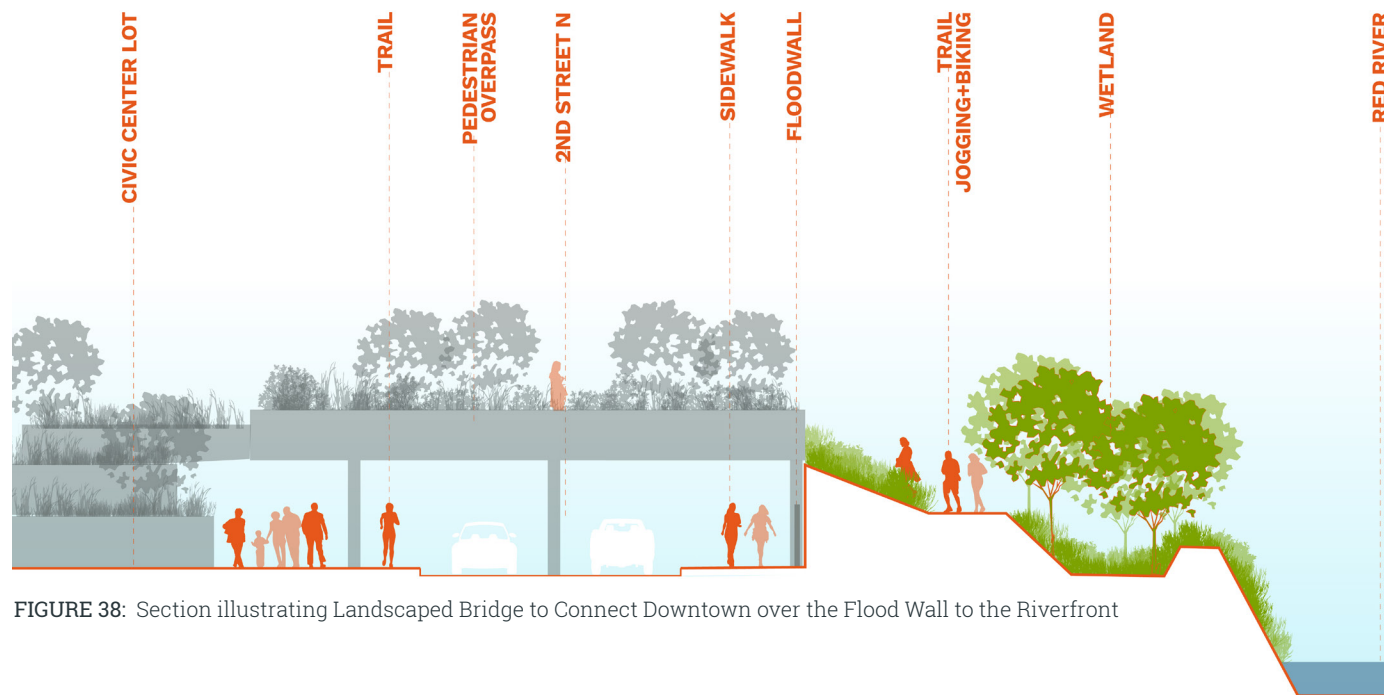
Section illustrating Landscaped Bridge to Connect Downtown over the Flood Wall to the Riverfront
